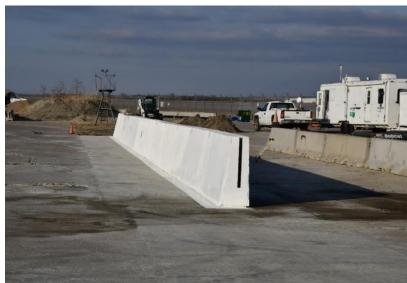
Test Installation Photographs, Test No. ABCBRM-1
